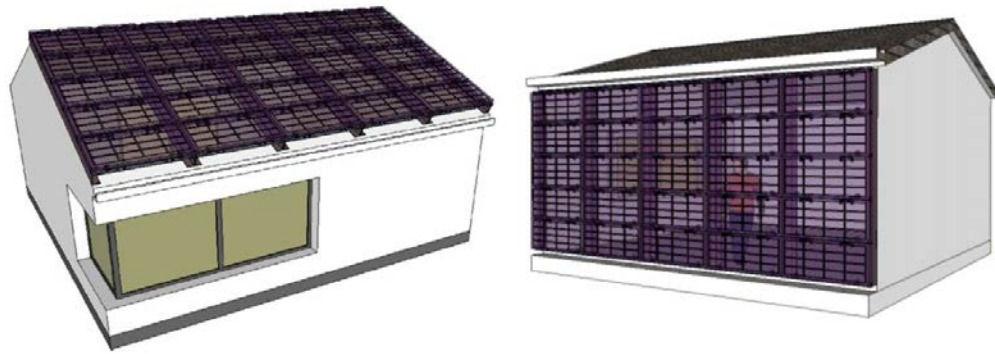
Architectural designs for BIPV in roof and façade of a building [164]
